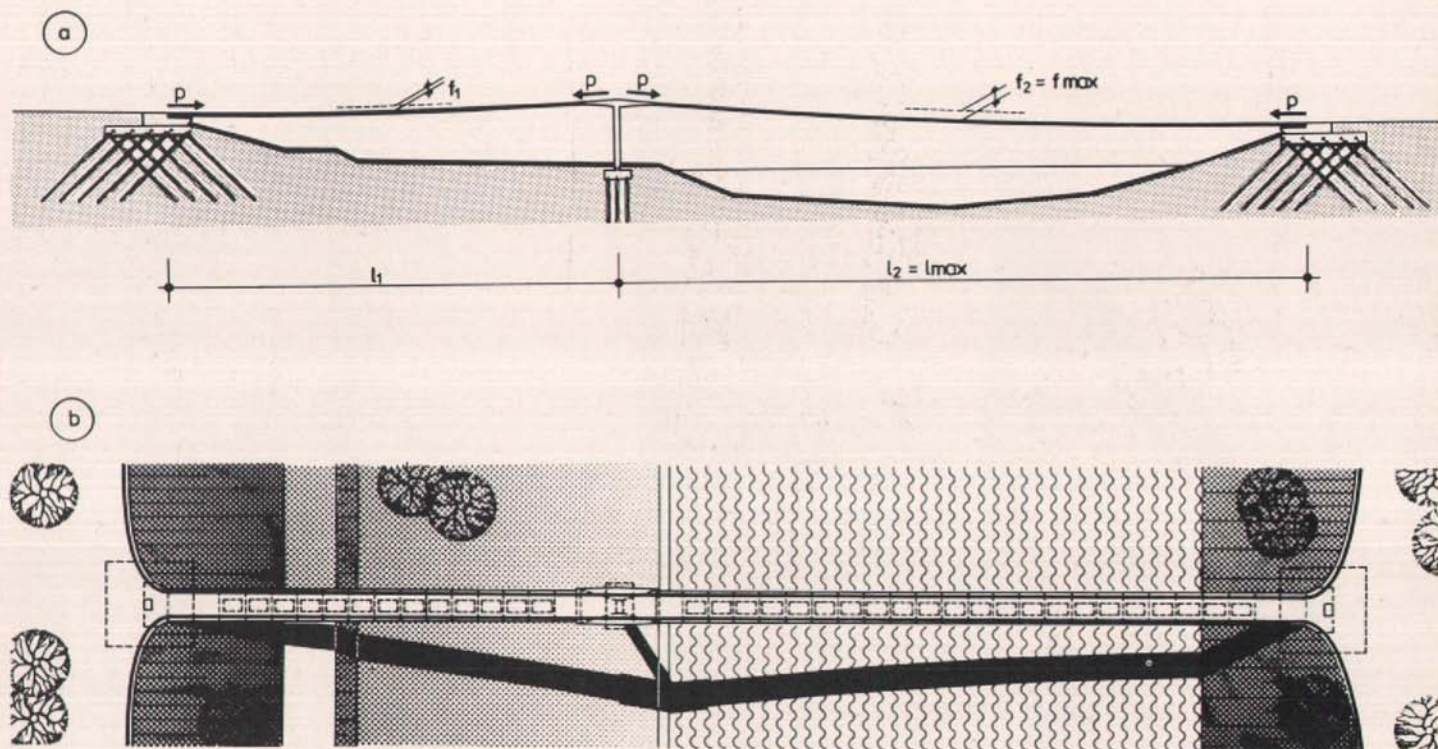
Typical structural configuration of pedestrian bridge: (a) longitudinal section; (b) plan.
